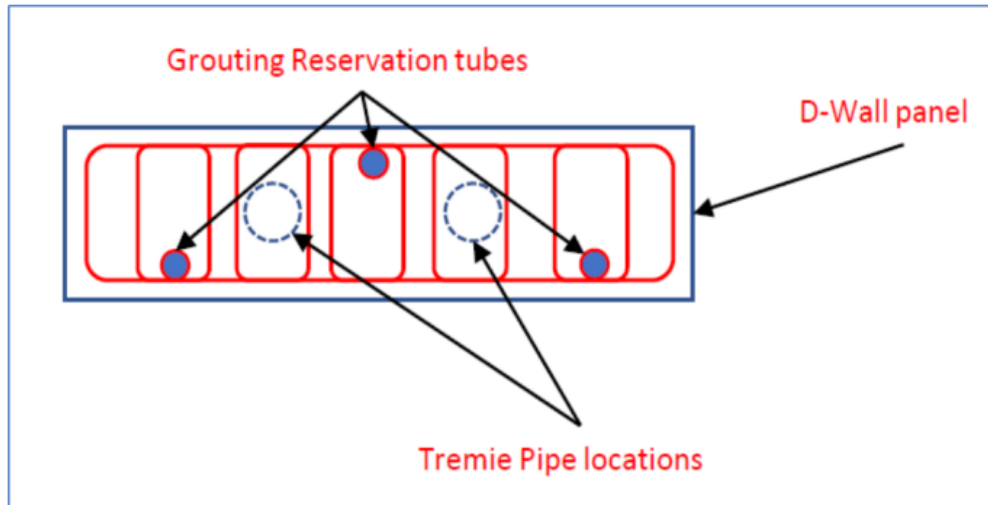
Grouting Reservation Tube layout in a Diaphragm Wall Panel
